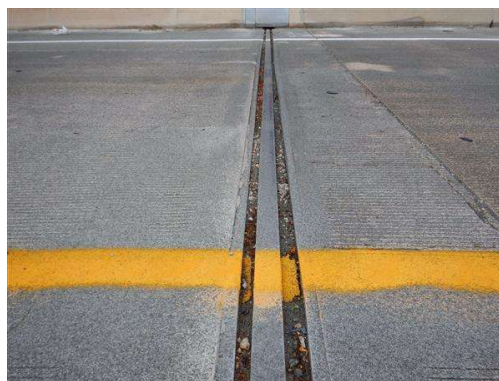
Expansion joint filled with debris at Pier 7A looking West
